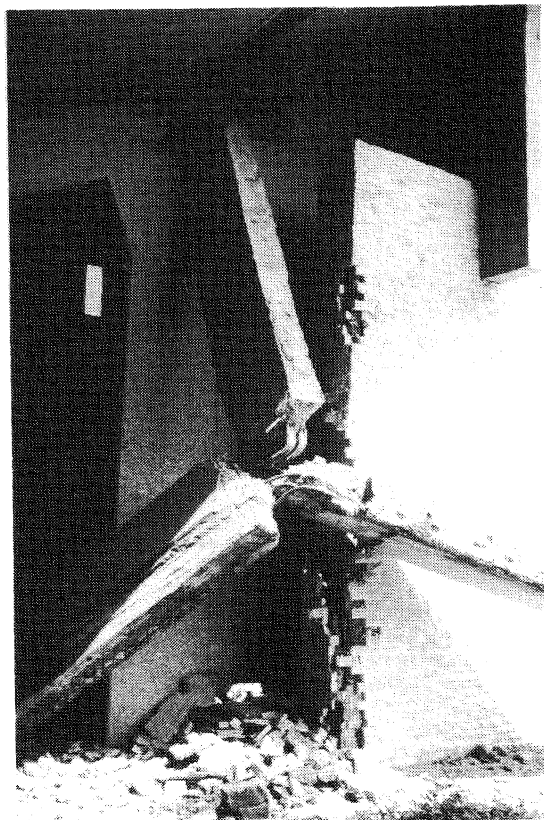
Church at Munoz; collapse of reinforced concrete barge board with its supporting cantilever beams
